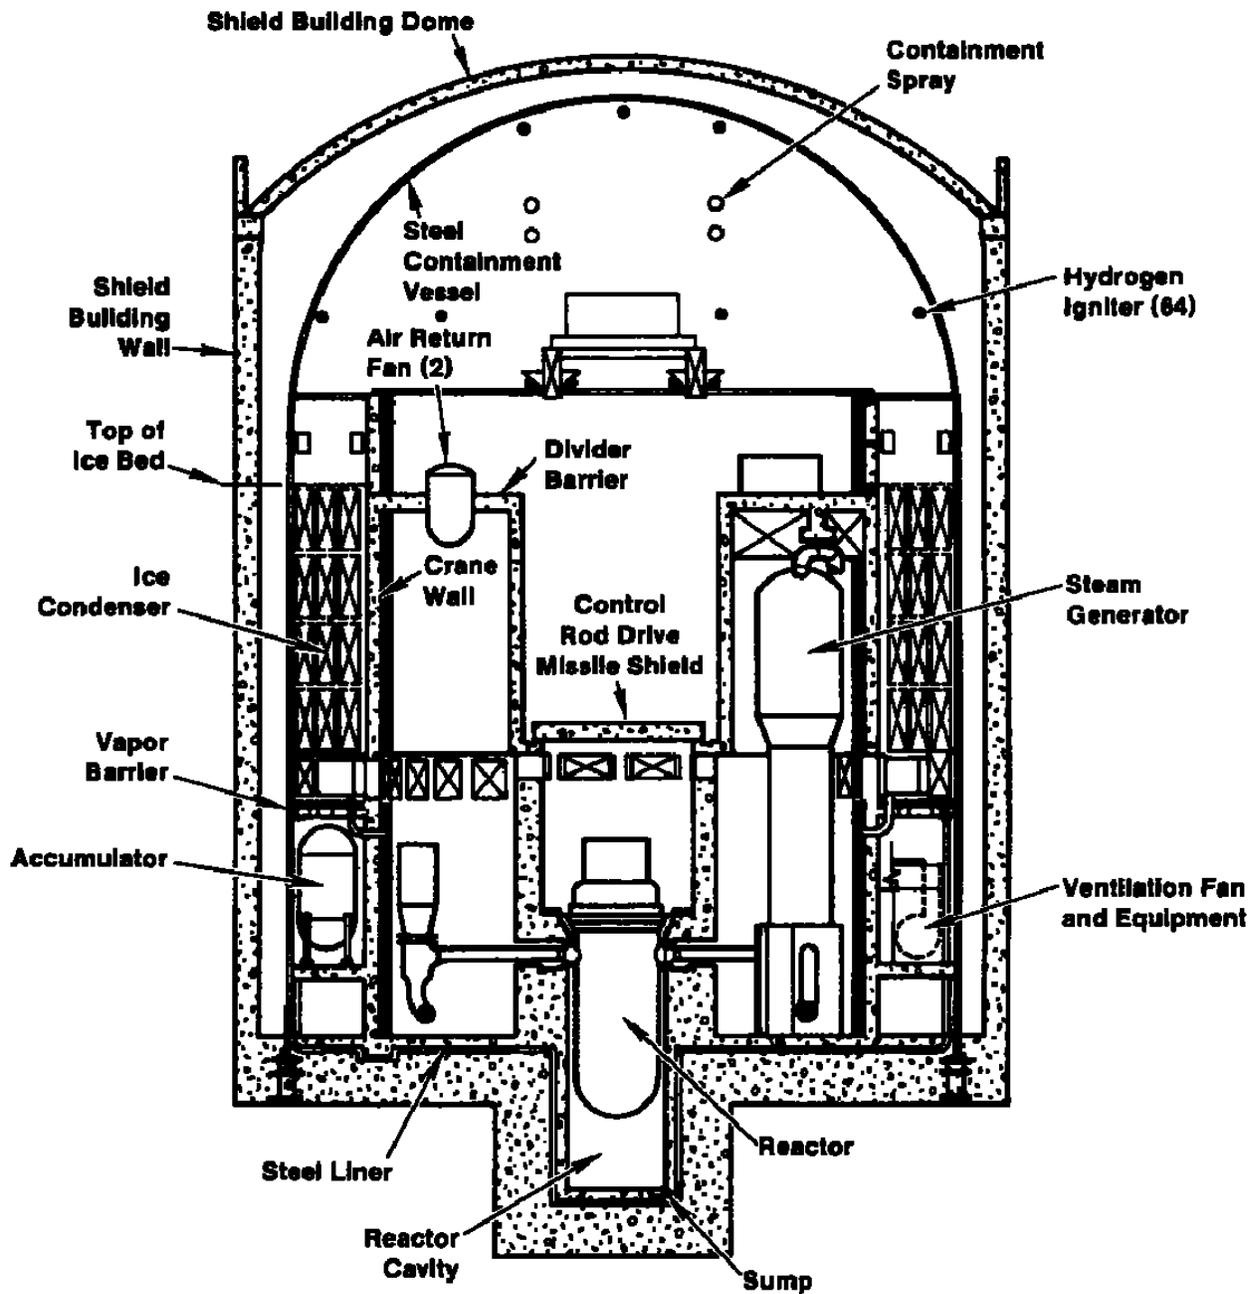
Free-Standing Steel Ice Condenser Containment with Steel Reinforced Concrete Shield Building
